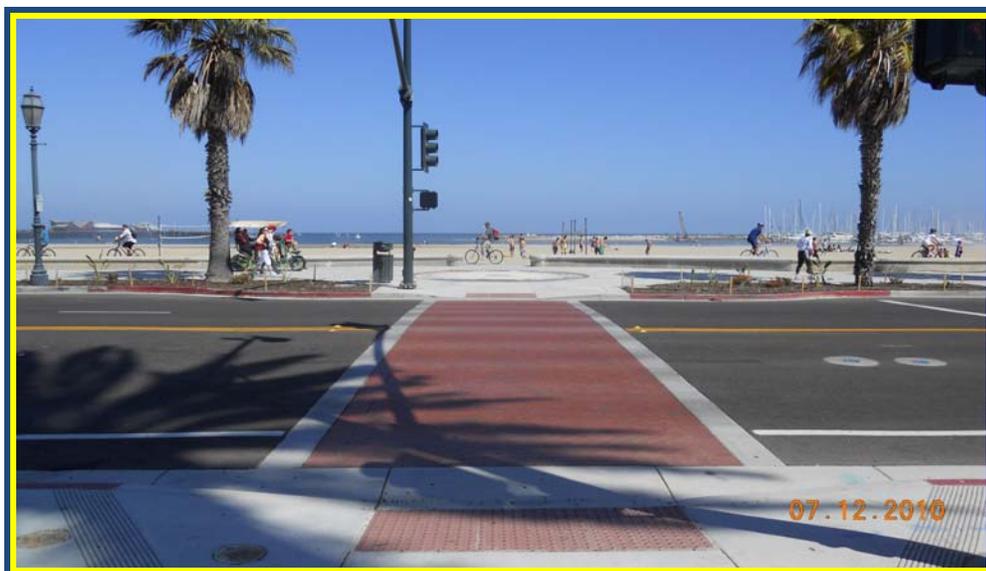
New Pedestrian Crosswalk at Ambassador Park
